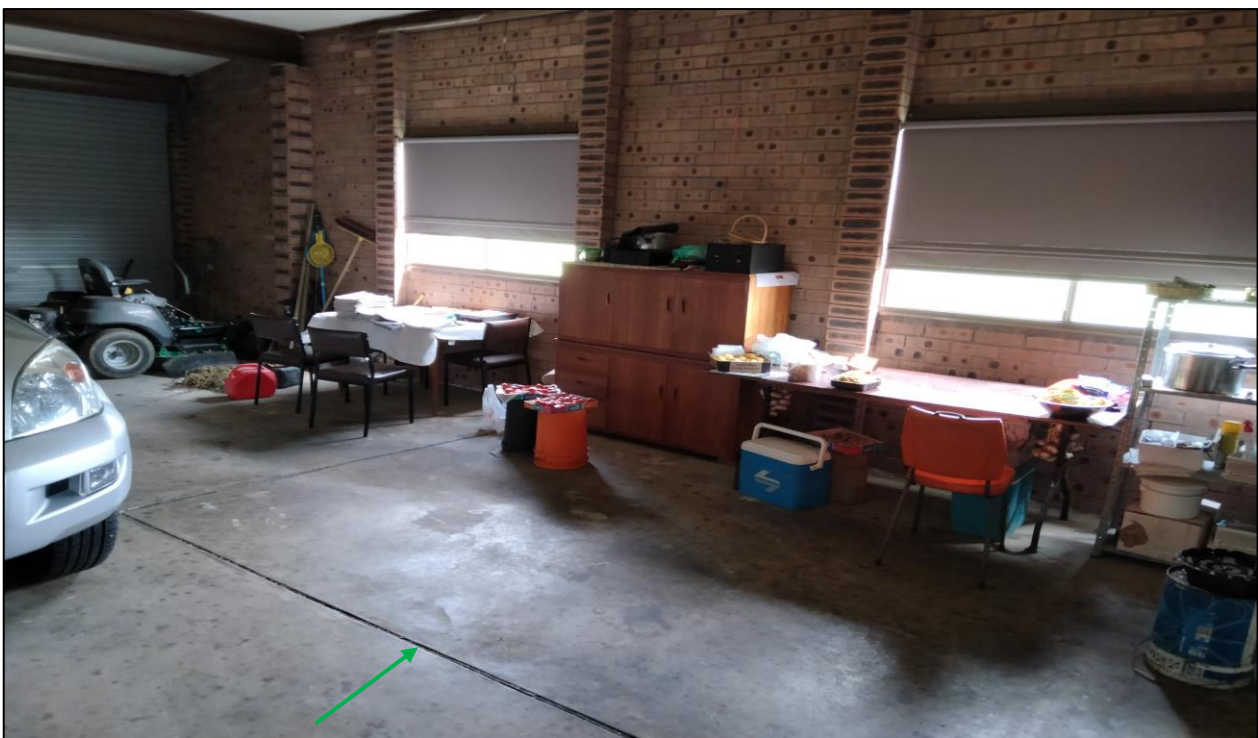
Building internal, garage, non-asbestos containing independent fibre cement fragment used as part, as observed on 18/01/2022.
